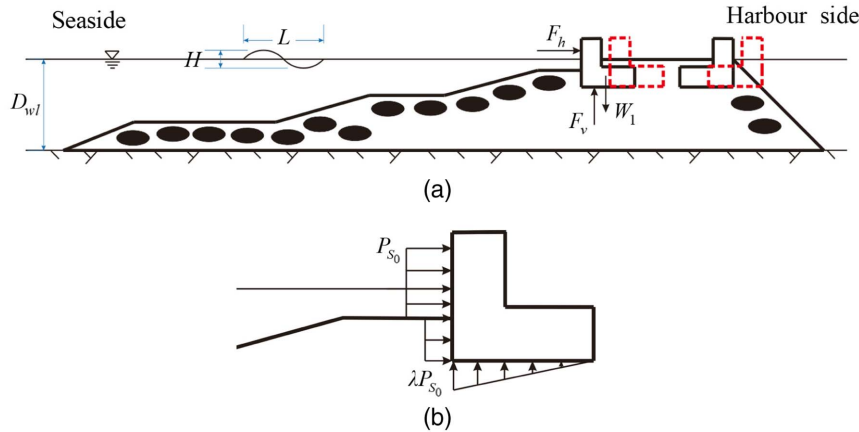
Crown wall sliding failure: (a) failure due to crown wall sliding; and (b) crown wall.
